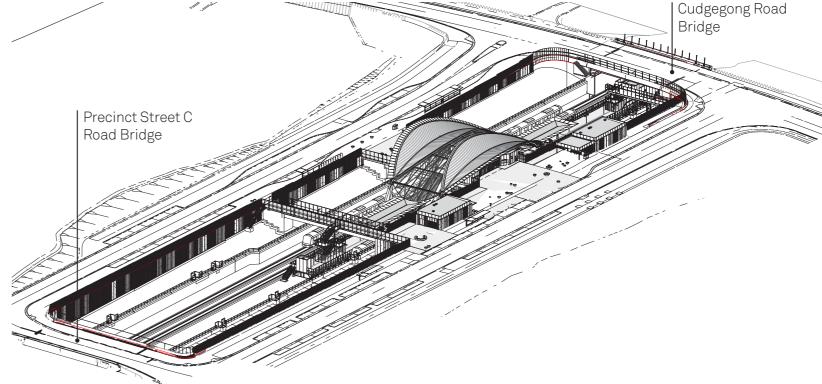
CUD\_Cudgegong Road Axonometric showing Cudgegong Road and Precinct Street C Rail Over Bridges. Source: HASSELL.
